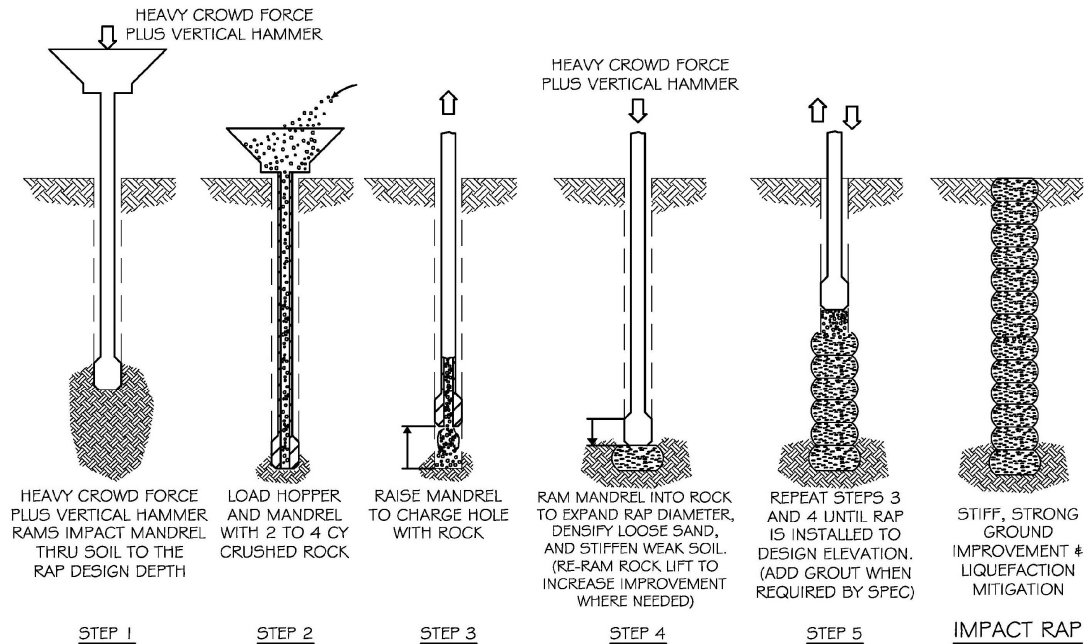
Impact Rammed Aggregate Pier Construction Process
